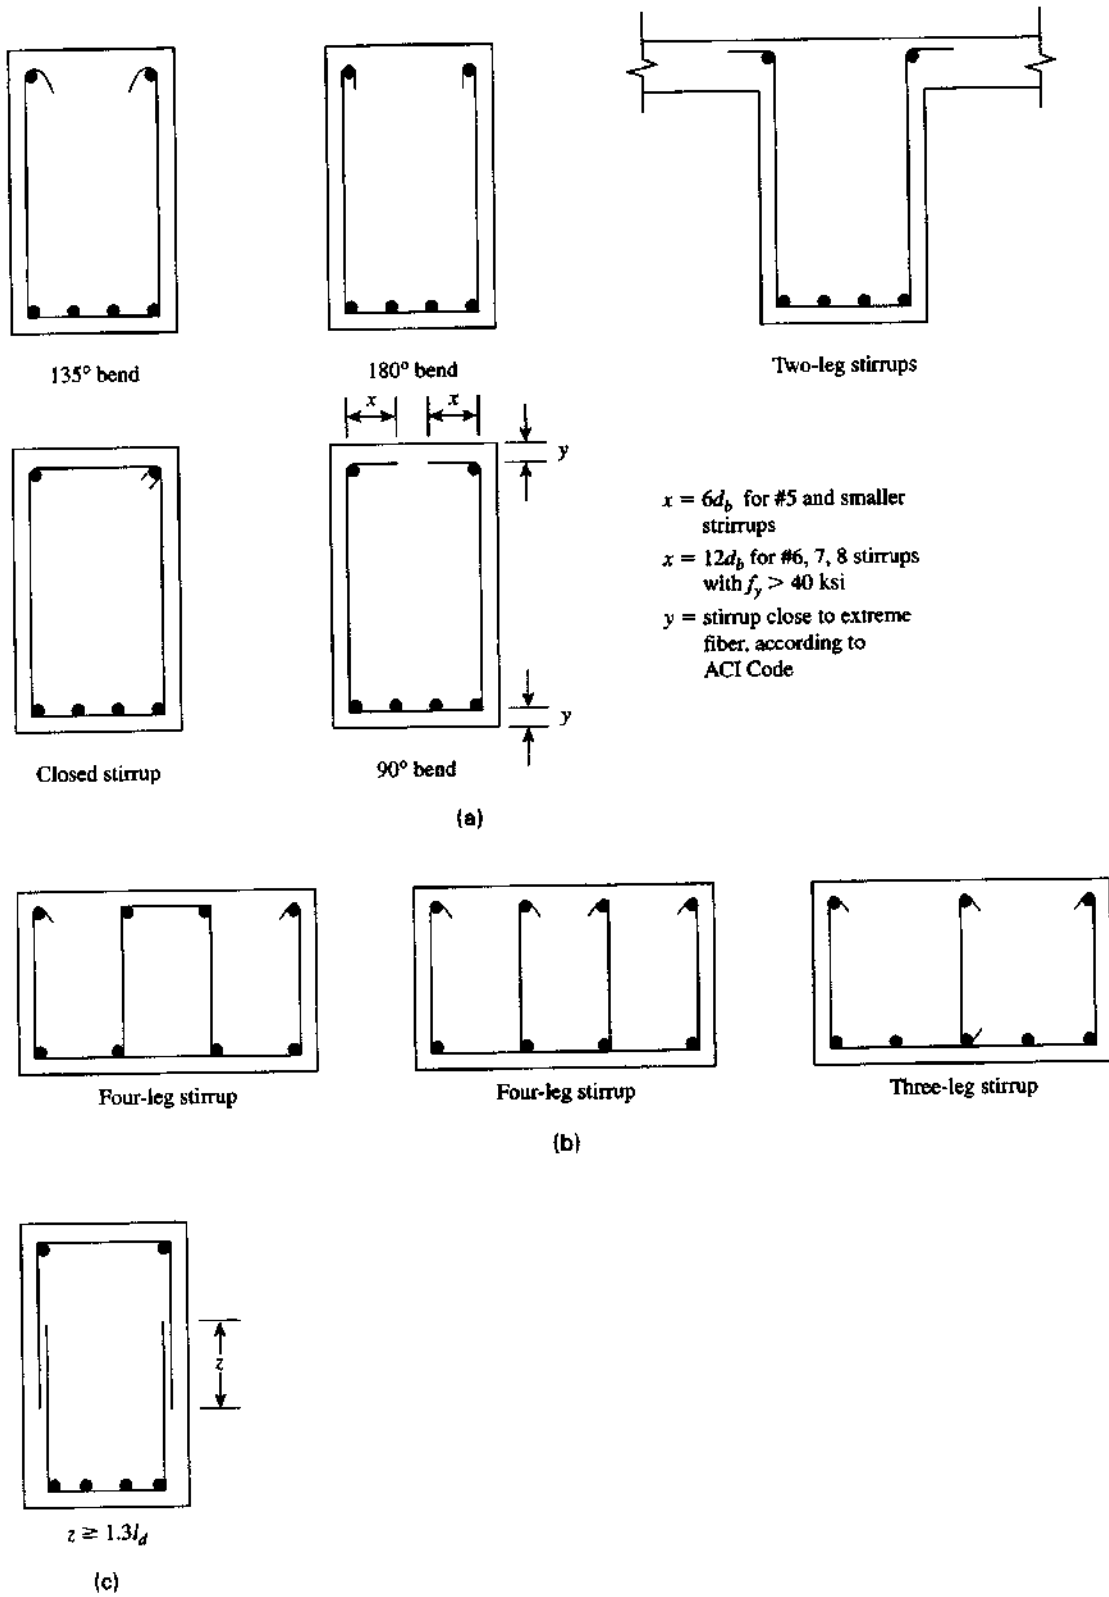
Stirrup types: (a) U-stirrups enclosing longitudinal bars, anchorage lengths, and closed stirrups, (b) multileg stirrups, and (c) spliced stirrups.
